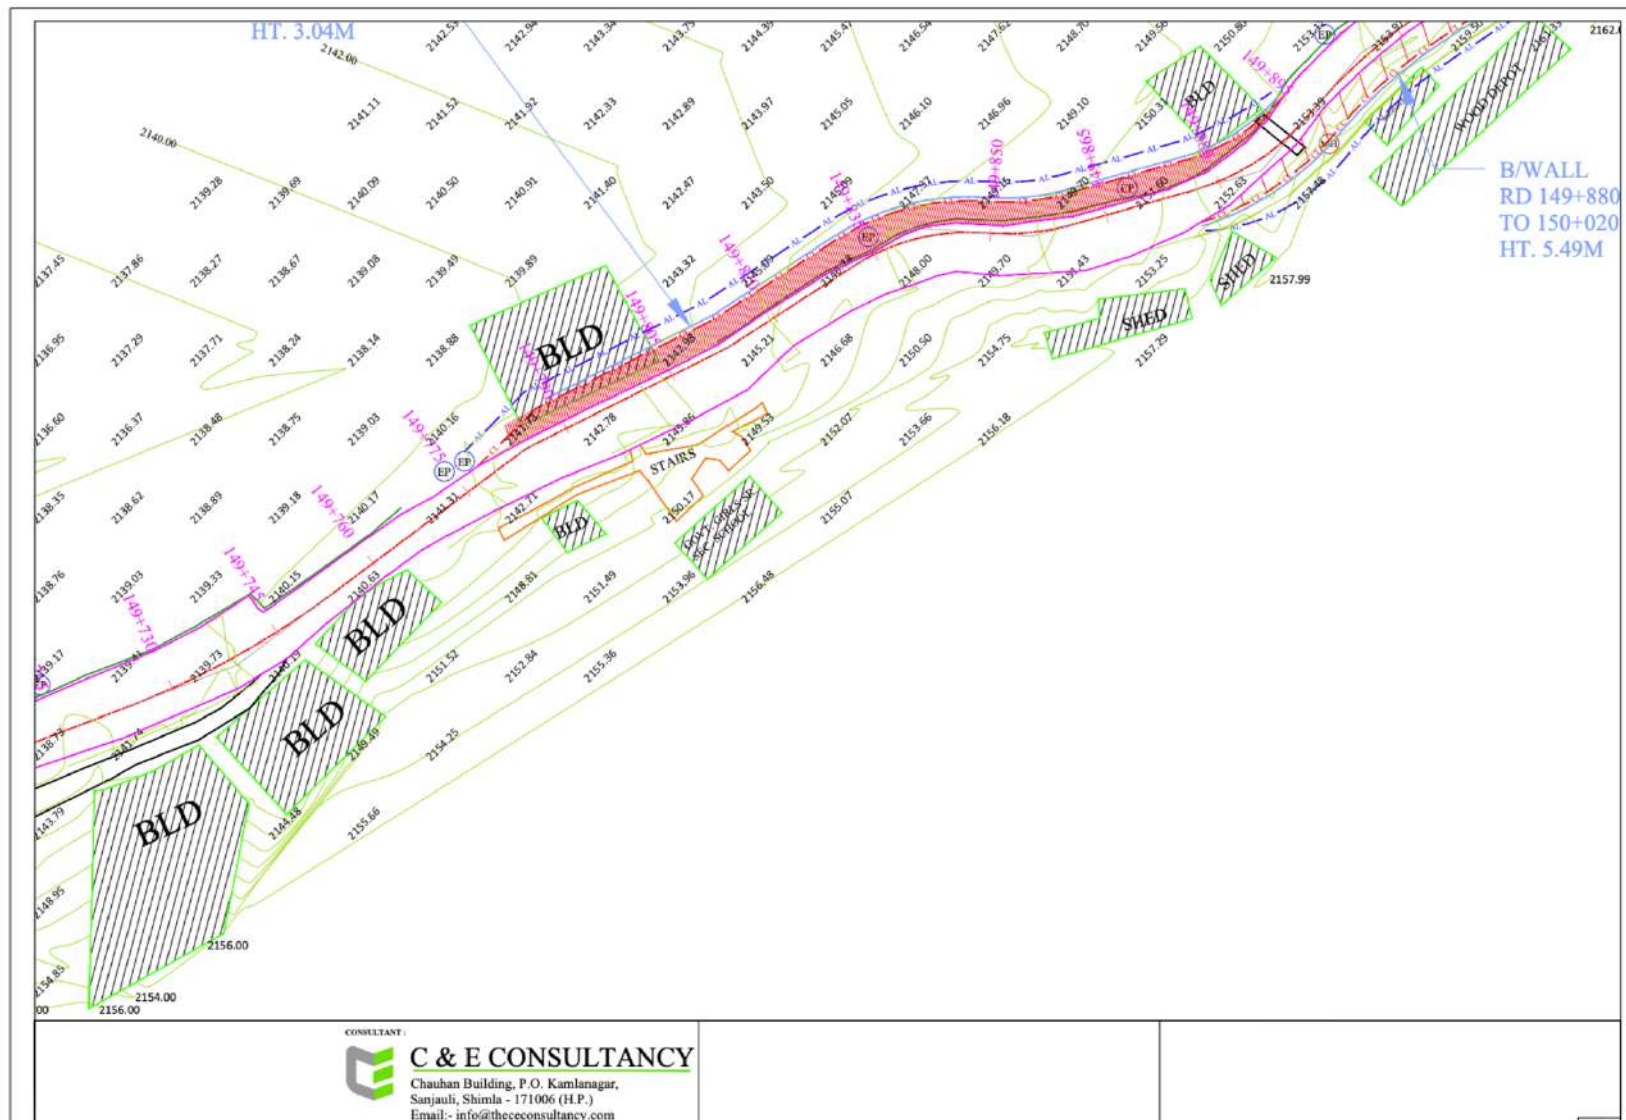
Proposed Road Design for the Improvement of MDR-67 Road Section (Victory Tunnel to Auckland Tunnel) - 11
